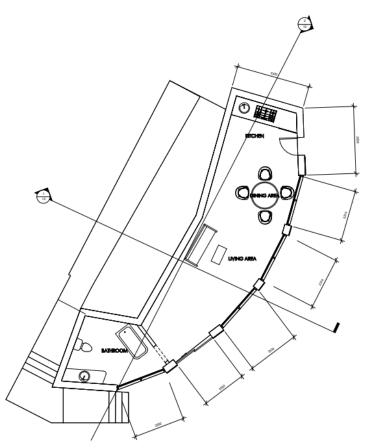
Ground floor plan of the secondary dwelling (Source: RCD Projects)
